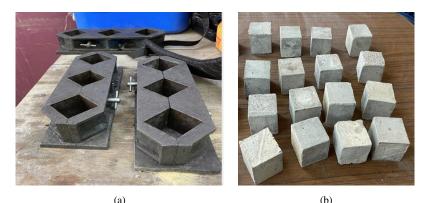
(a) Molds of compressive strength. (b) Cubic specimens after casting of PRPC
